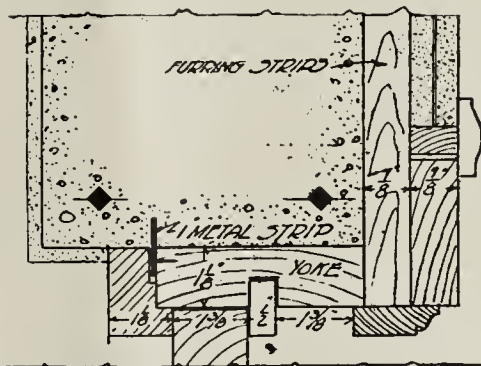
Section through window head in 6-inch wall. Windows in 8-inch wall similar.
